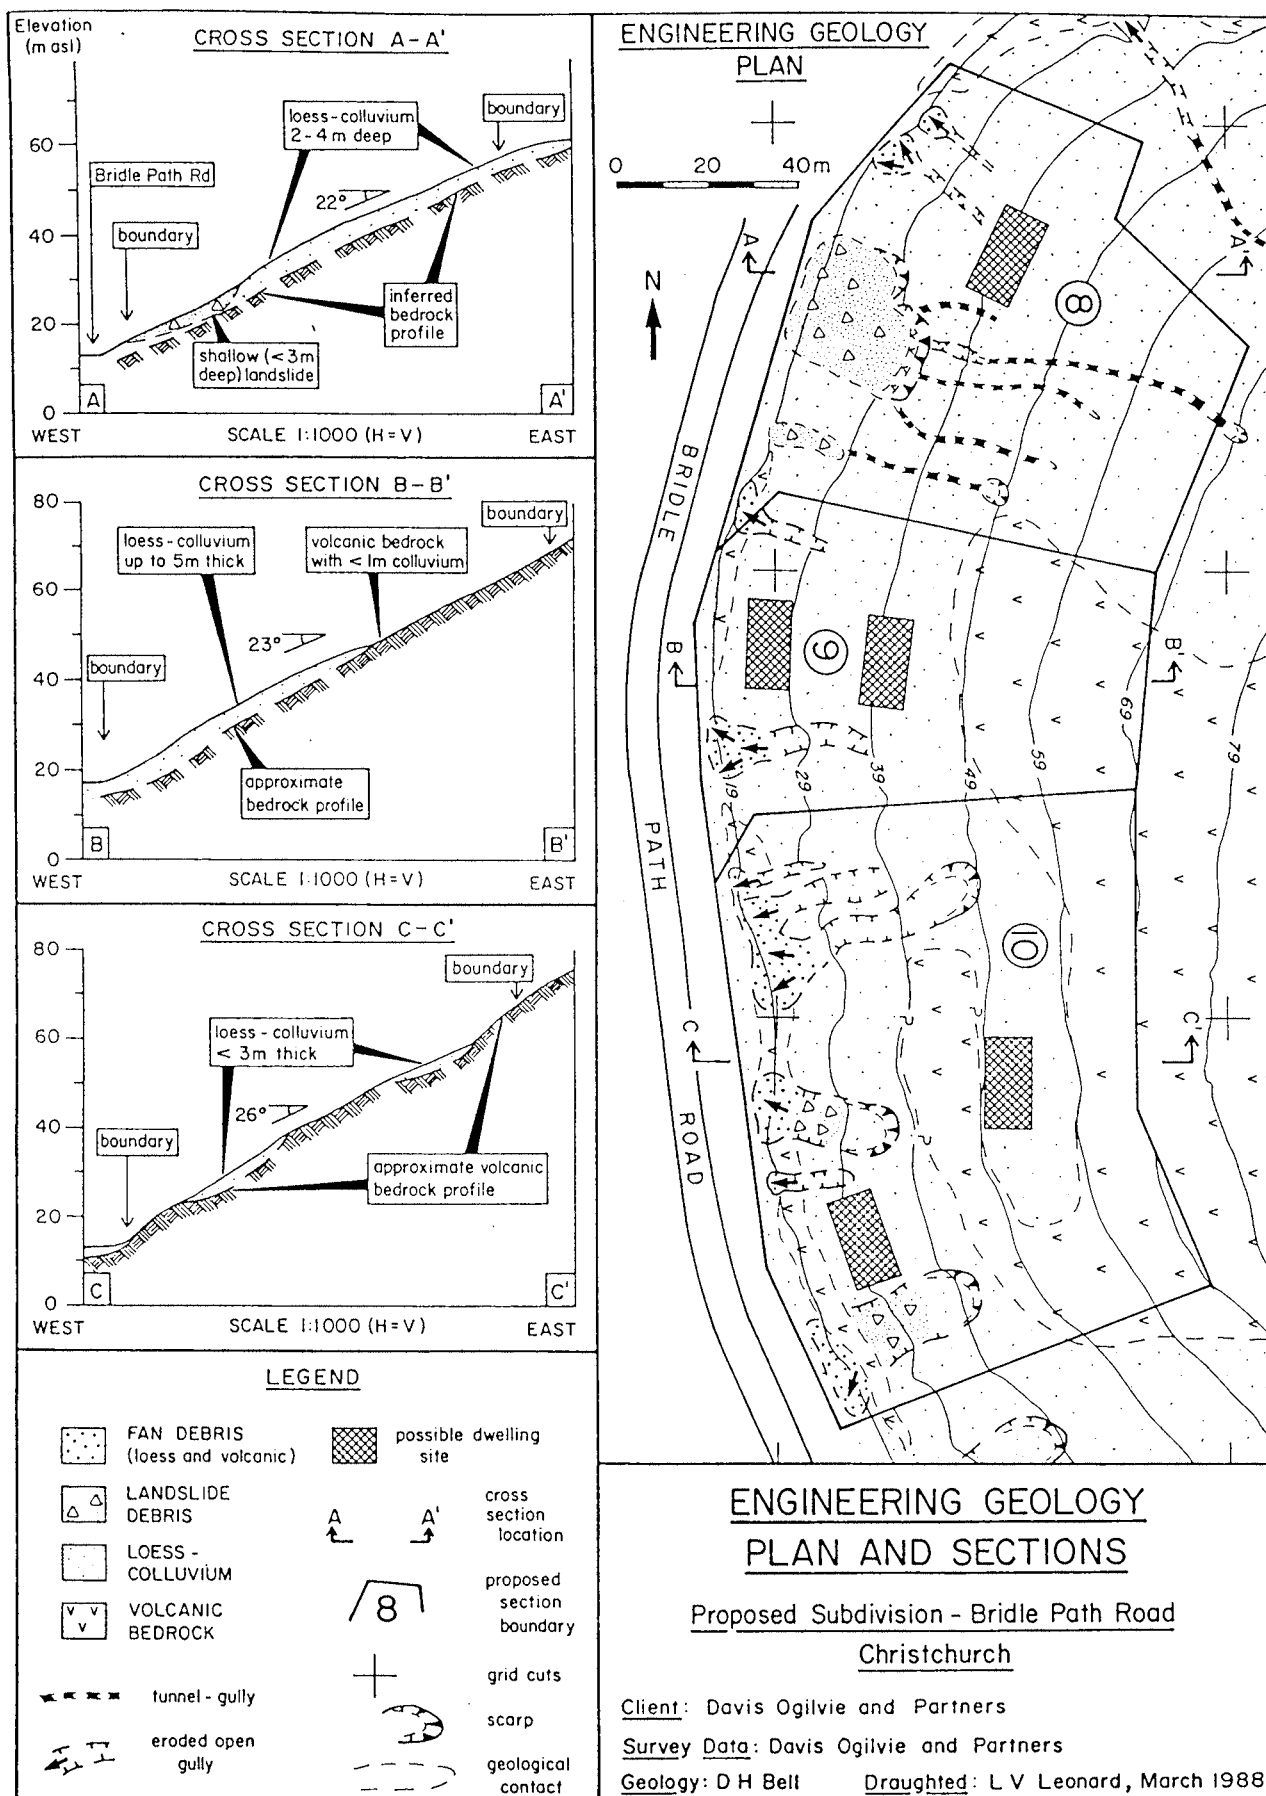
Engineering geology assessment for proposed small subdivision, Christchurch
